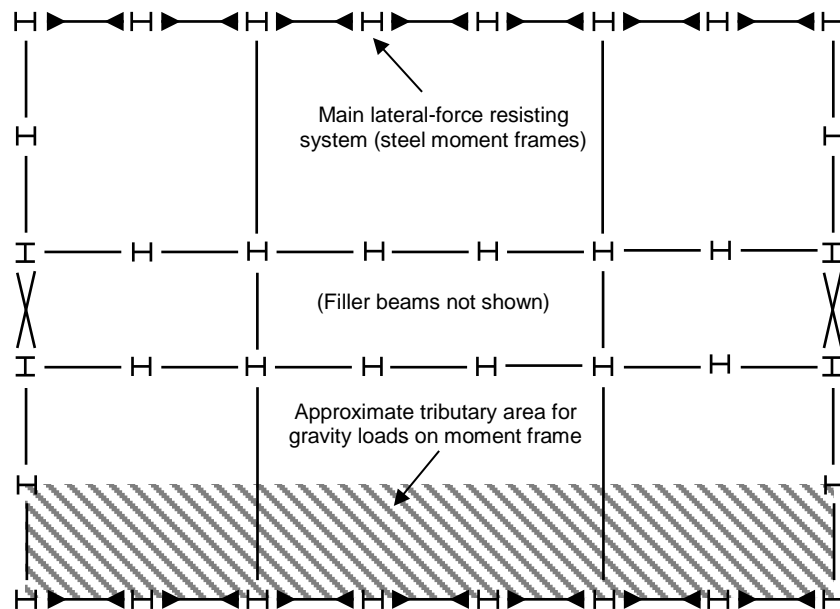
Type II non-ductile moment frame 4-story building plan
